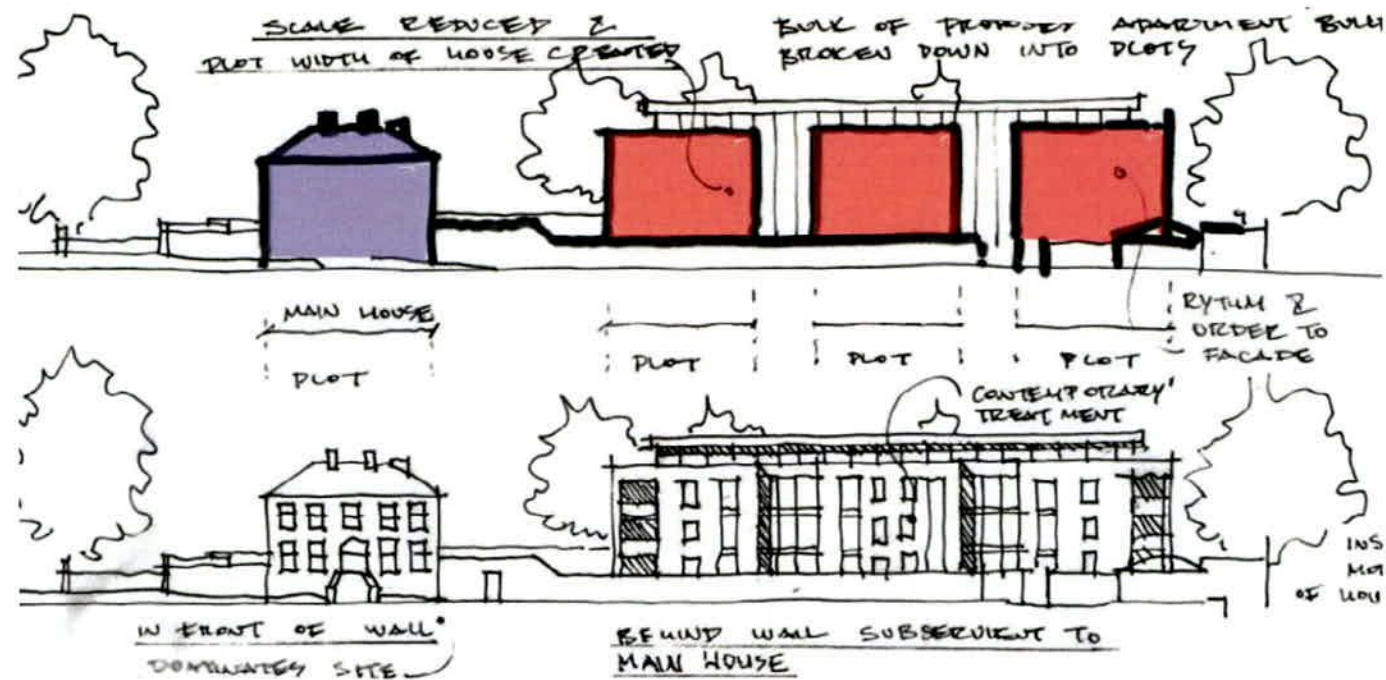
IMAGE : Diagrammatic Section - Relationship between New Block and Prospect House
